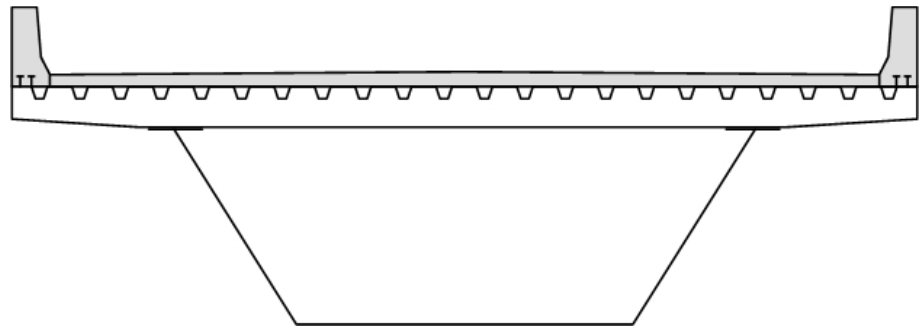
Box Girder Cross Section (at Floorbeam) with Orthotropic Steel Plate Deck
